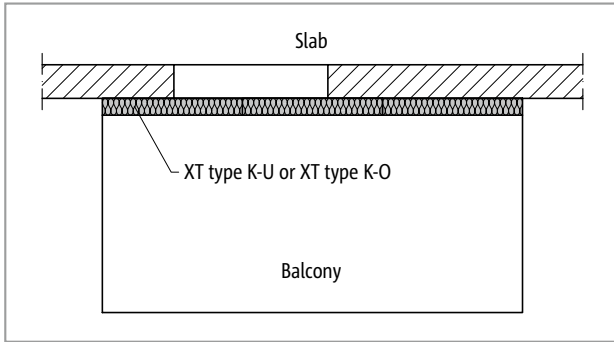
Schöck Isokorb® XT type K-U/K-O: Cantilevered balcony
